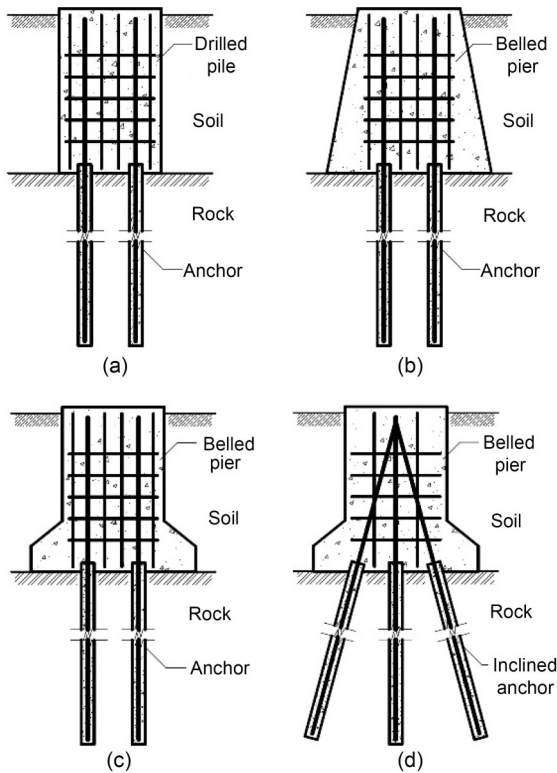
Examples for the anchored piers: (a) anchored pile foundation; (b) anchored pier foundation (cap); (c) anchored pier foundation (belled pier); (d) anchored pier foundation (inclined anchor)
